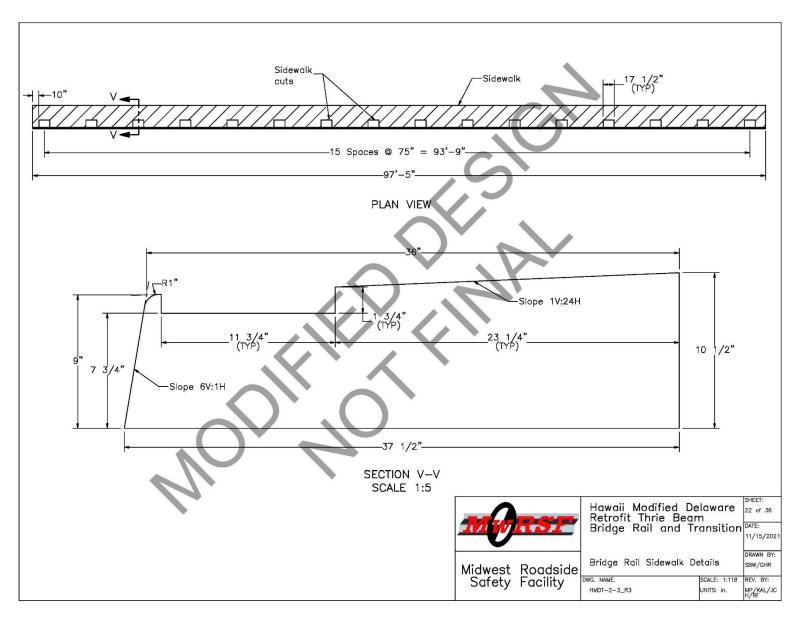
Bridge Rail Sidewalk Details, Test Nos. HMDT-2 and HMDT-3
